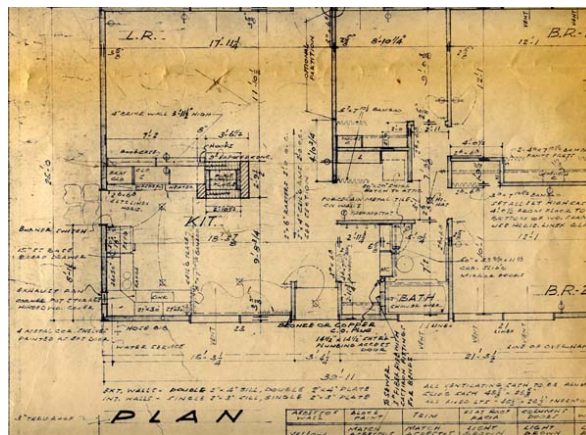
Plan for the Levittowner, from a 1953 architectural drawing (www.llewellynpark.org)
